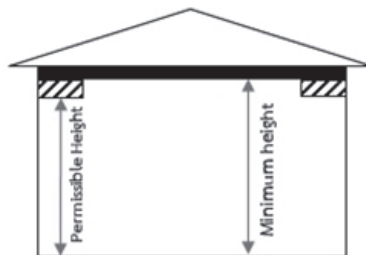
Height Measurement of meeting room with beams or structures lower than the ceiling.
